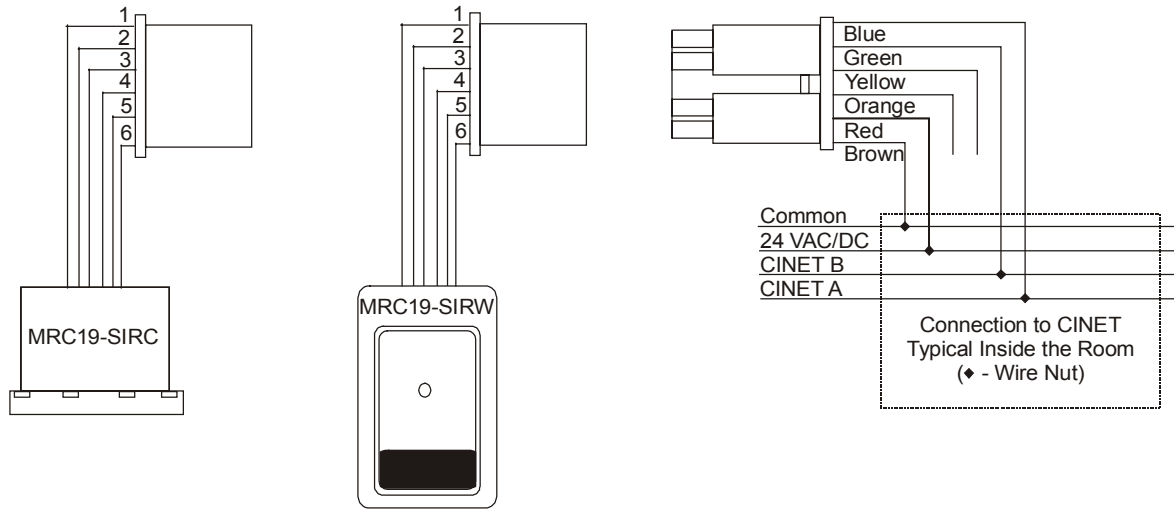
Wall Mount/Ceiling Mount SIR Wiring
